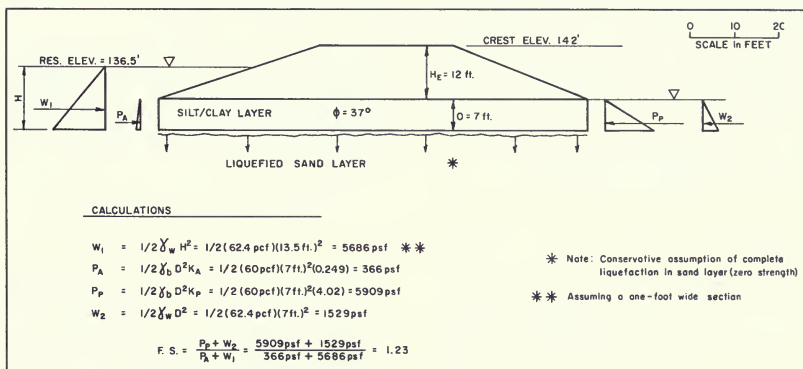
Horizontal Sliding Analysis for Station 12 (Reservoir Elevation = 136.5 feet)
